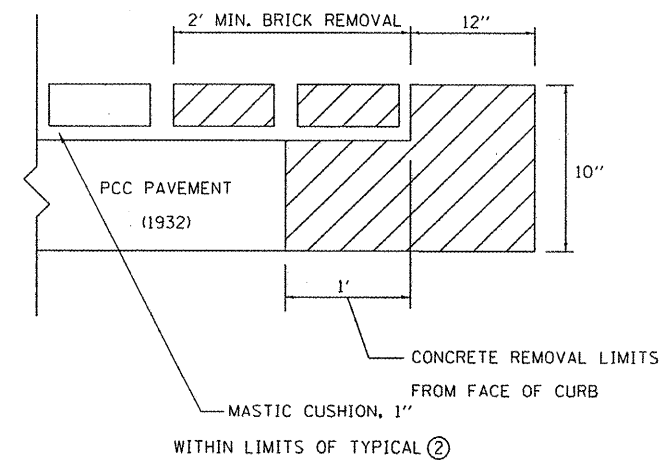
DETAIL OF BRICK PAVEMENT REMOVAL AND REPLACEMENT
